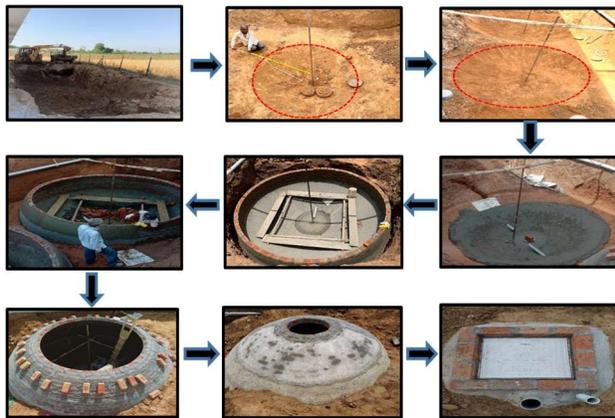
Stepwise construction of Rainwater Harvesting Tank at NIF building.
